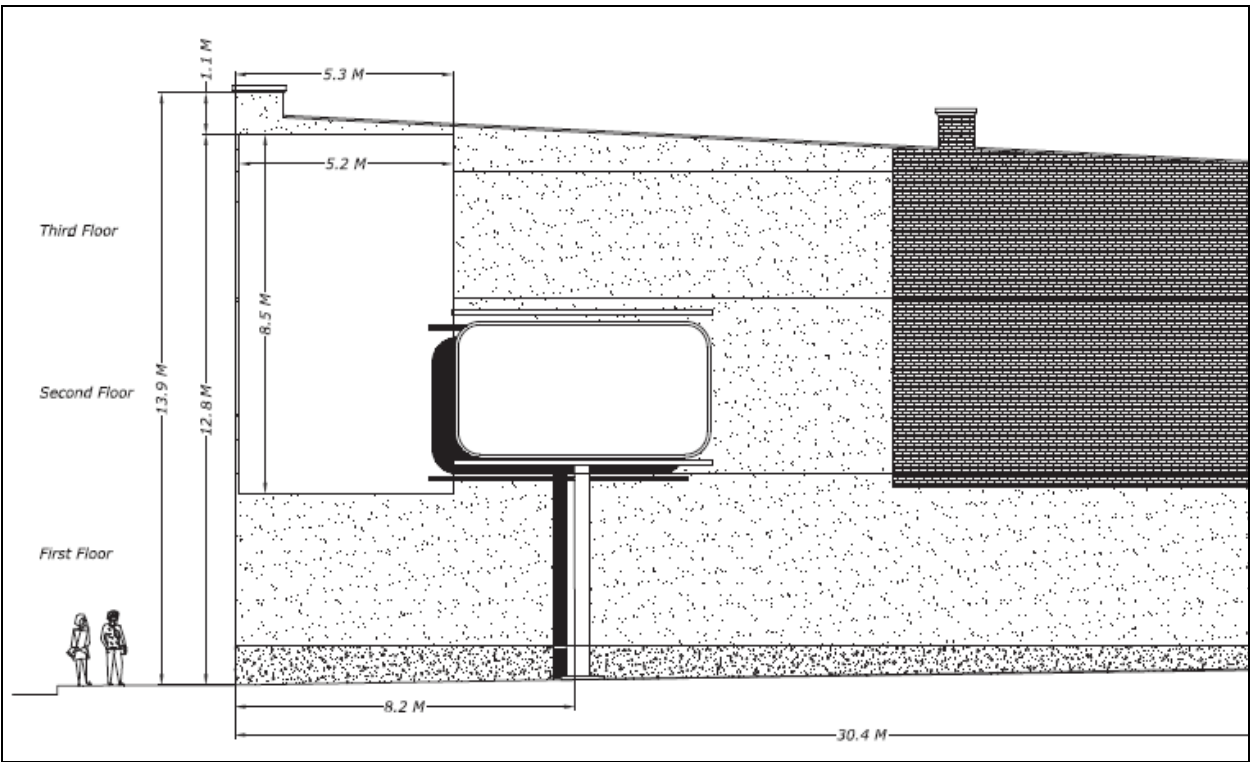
Photo Rendering of Proposed Sign at 71-73 King Street East
